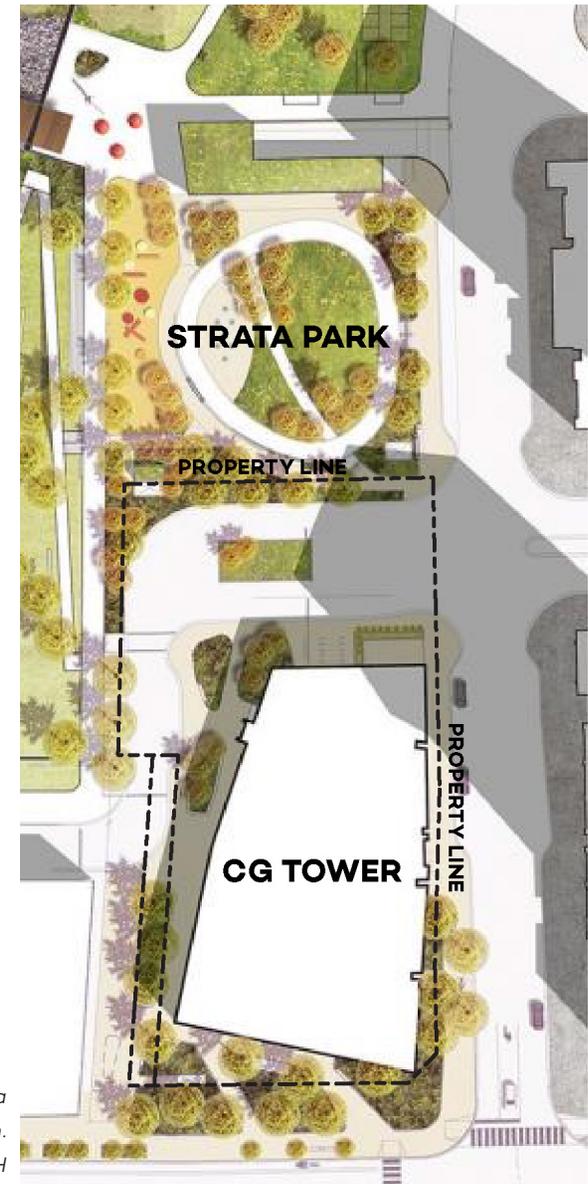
, Detail, Property Line and Strata Park. CG Tower site Landscape Plan.
